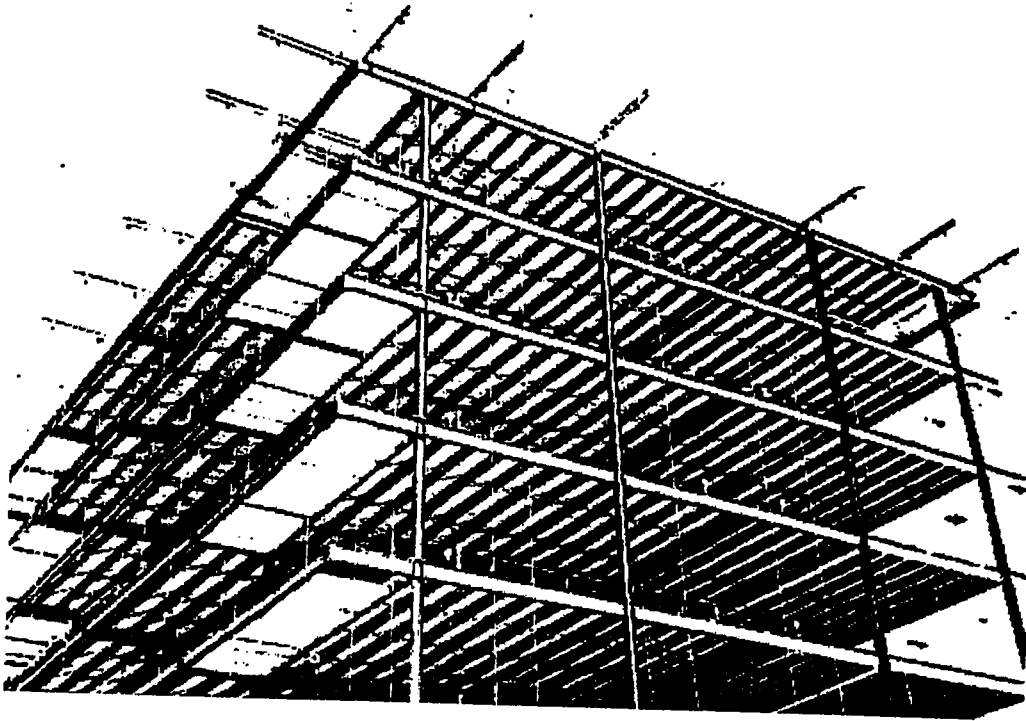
Cold-formed and hot-rolled steel structure (Stran-Steel Corporation)
